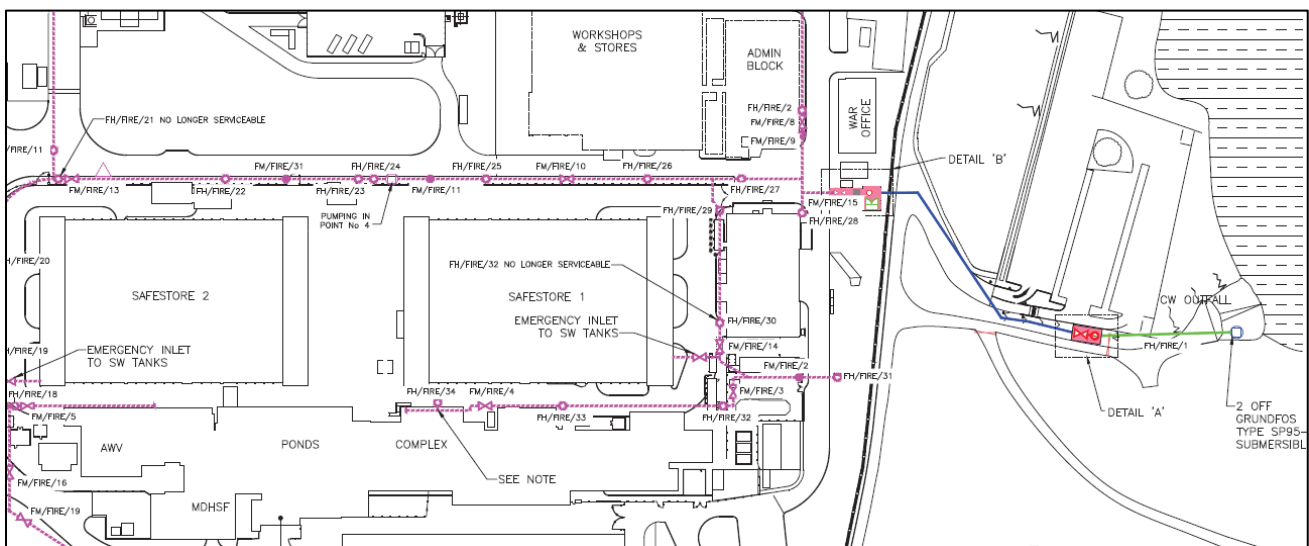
Extract (TRA-3210-LA-10872). Note: pipework downstream of 'Detail B' redundant)
